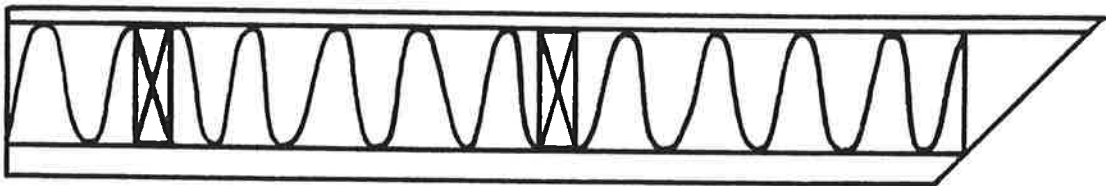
B. TOP VIEW OF A HALF WALL SECTION
